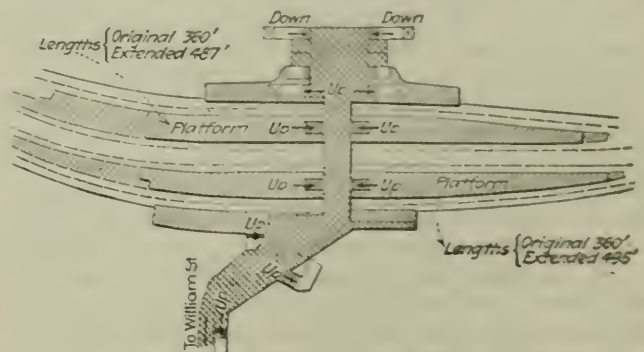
BROOKLYN BRIDGE STATION, NEW YORK SUBWAY
